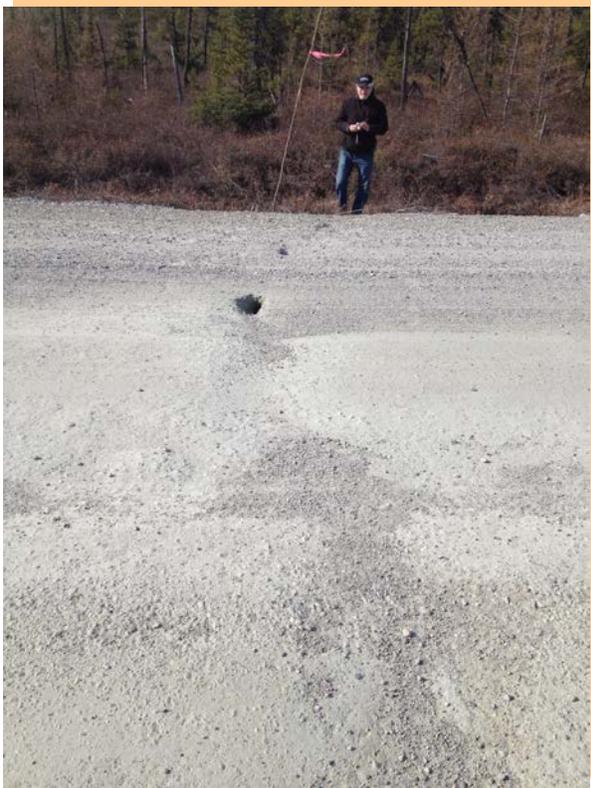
82+500 MTQ Transverse frost heave crack – facing north
